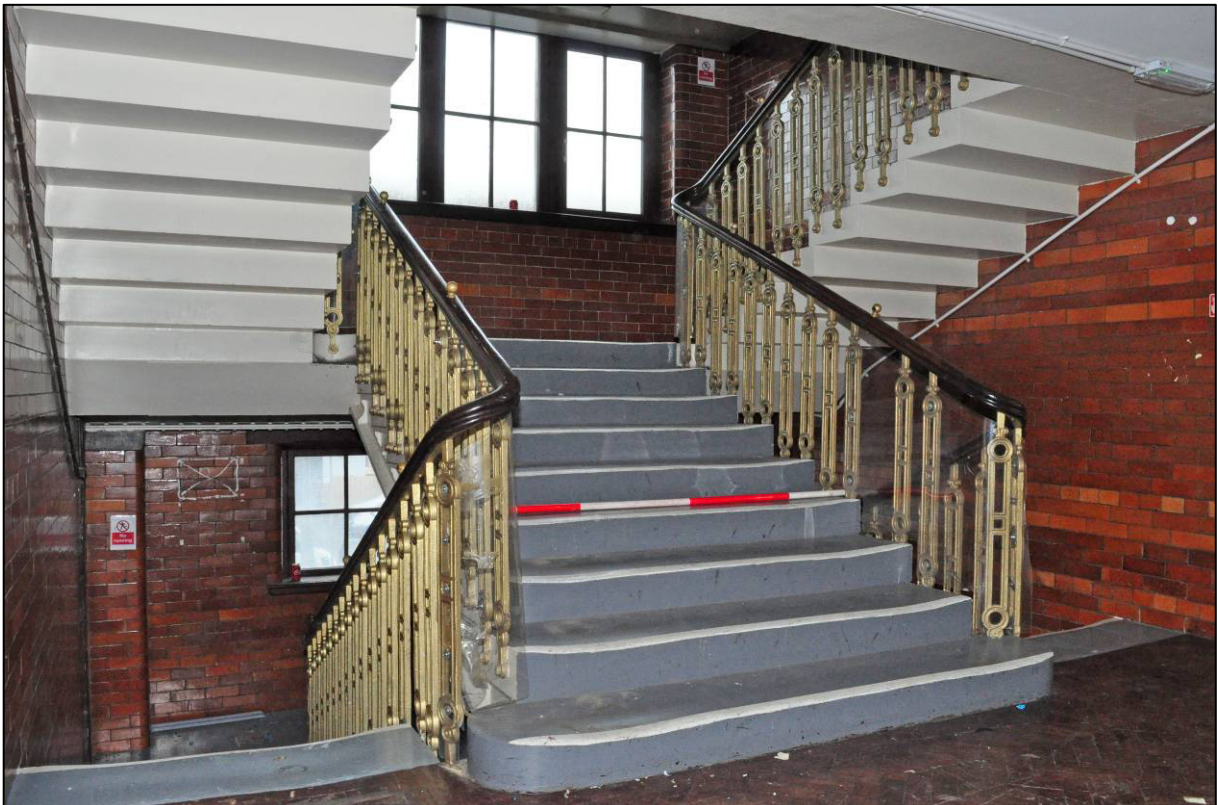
1895 Higher Board Boys' School, main staircase from half landing, looking SE (photo 2231).
